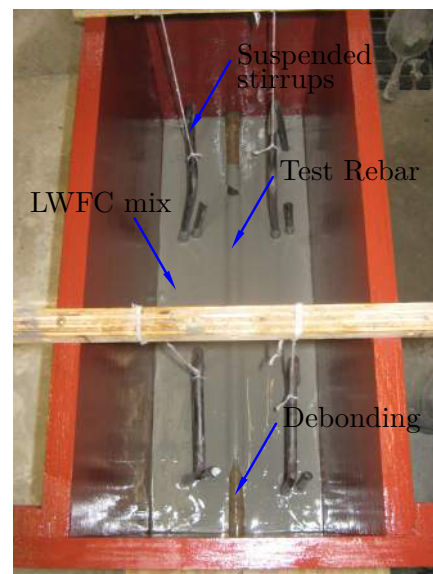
Top view of the inside of beam-end mould with fixed rebar and initial casting of a LWFC mix.
